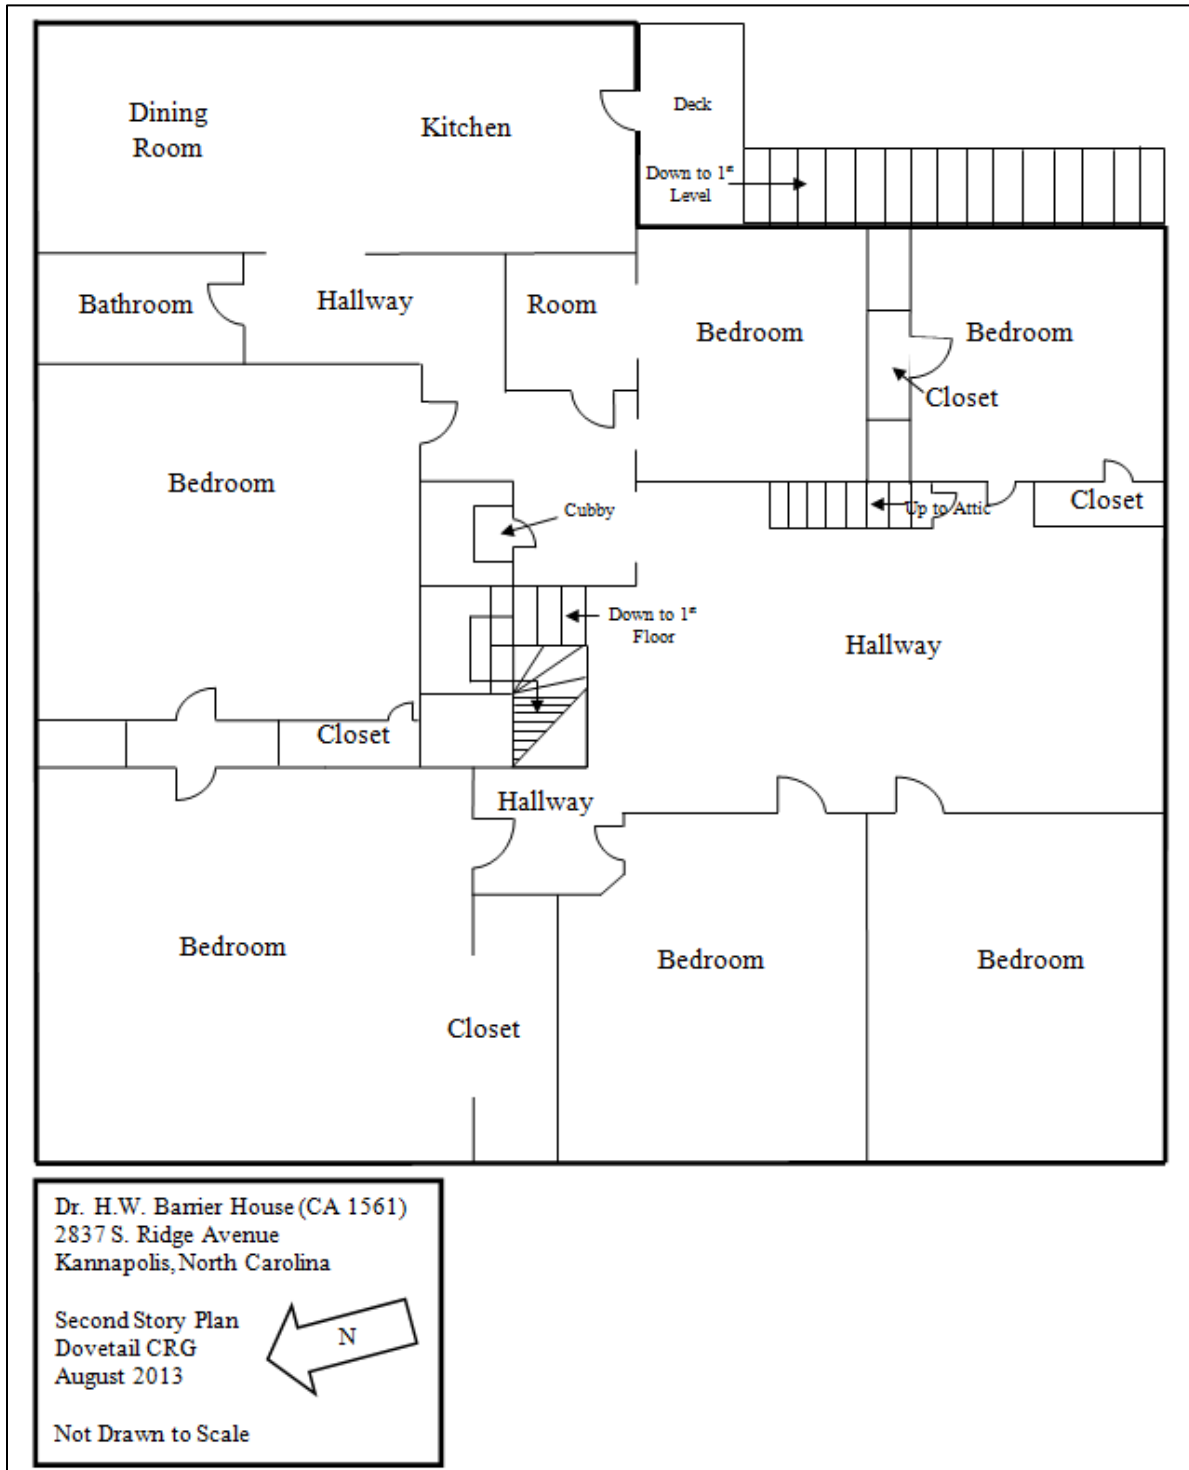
Second Story Plan of the Dr. H.W. Barrier House.
